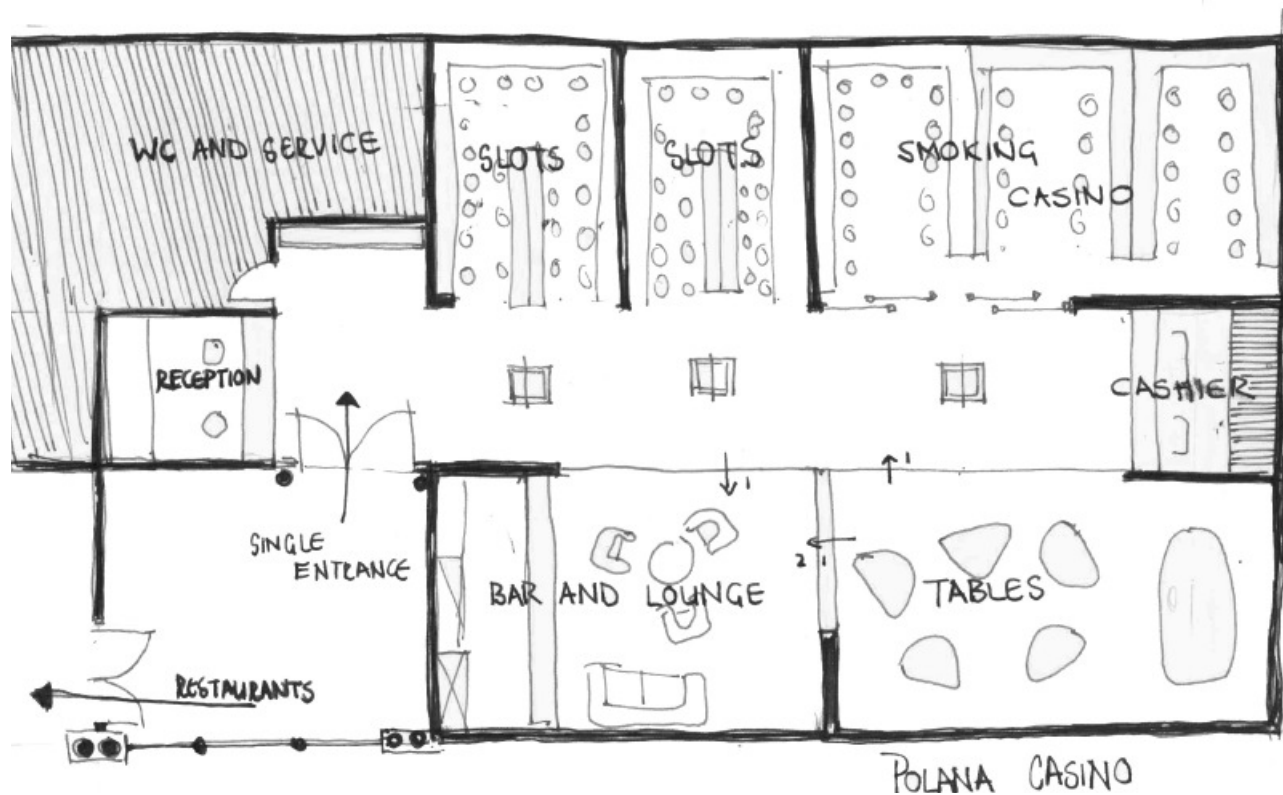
Sketch plan of Polana Casino. drawing by Author 2011
